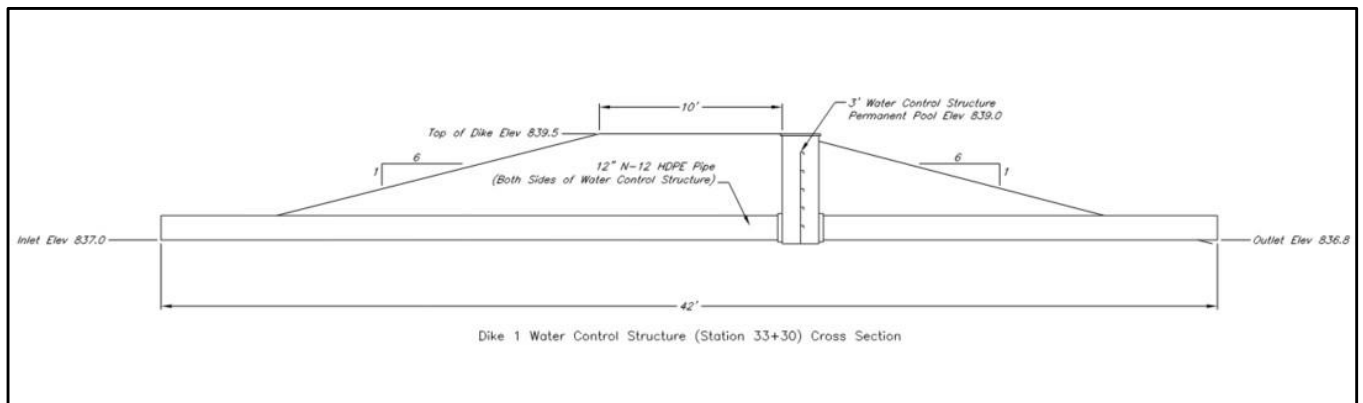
CROSS SECTION OF DIKE 1, DIKE 2 HAS THE SAME TOP WIDTH AND SIDE SLOPE
